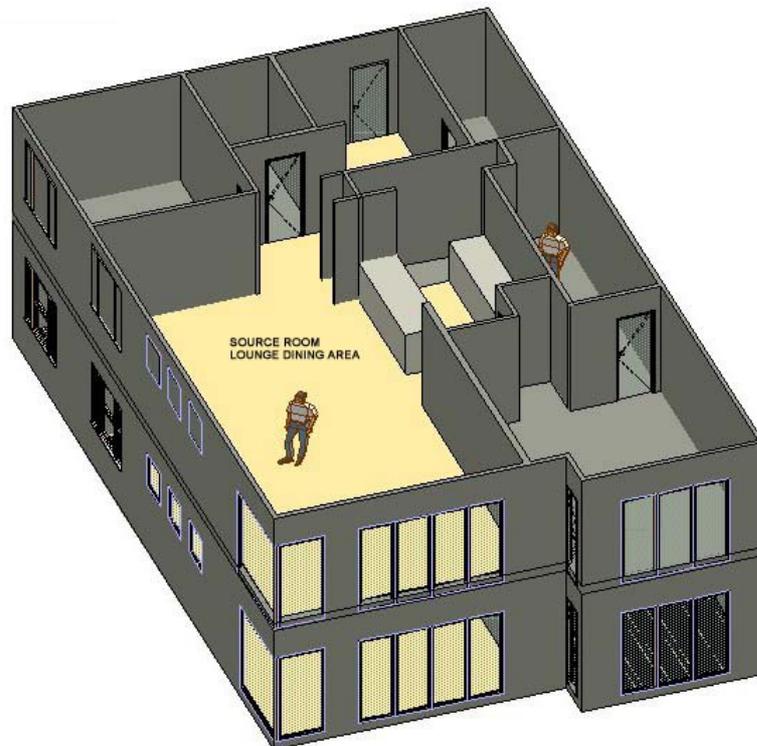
AXONOMETRIC OF SOURCE & RECEIVING ROOMS
